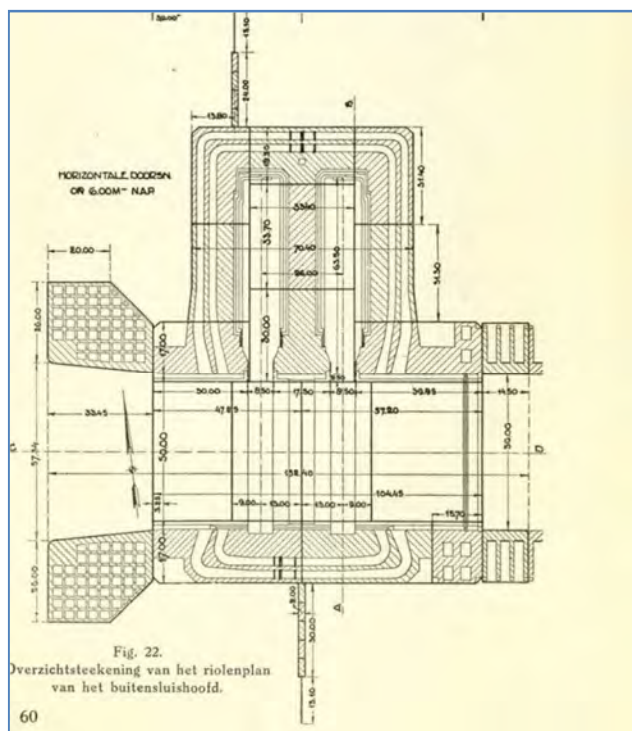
North Lock Outer Head: Horizontal Section of Short Culverts
